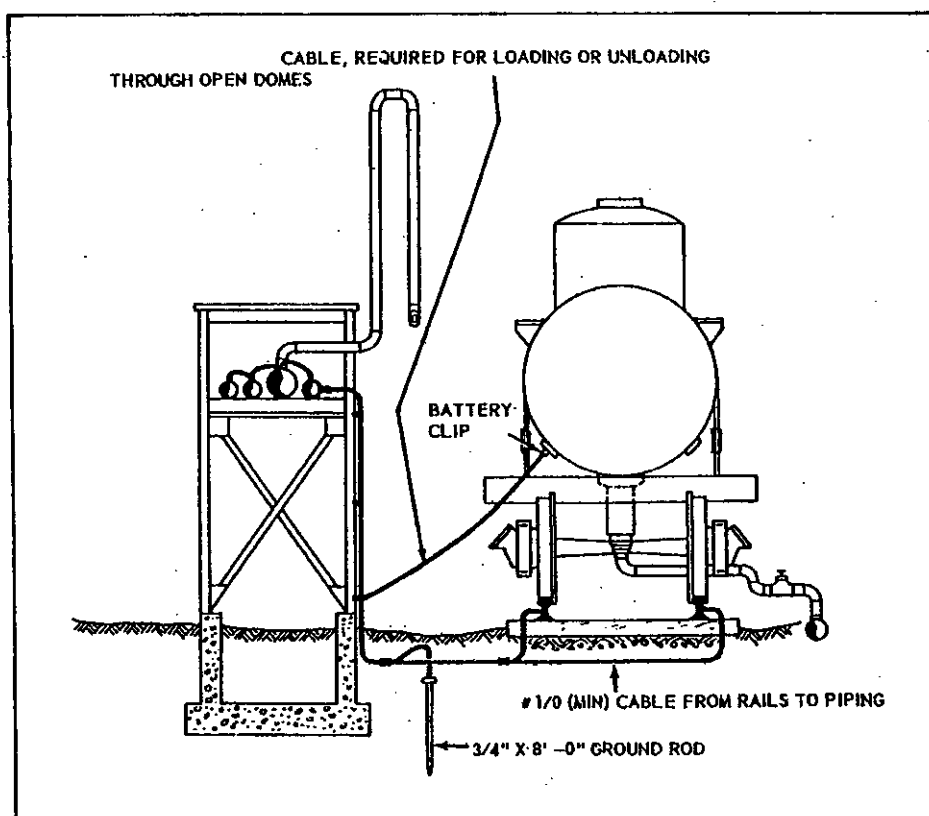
Static Connections for Loading and Unloading Tank Cars
